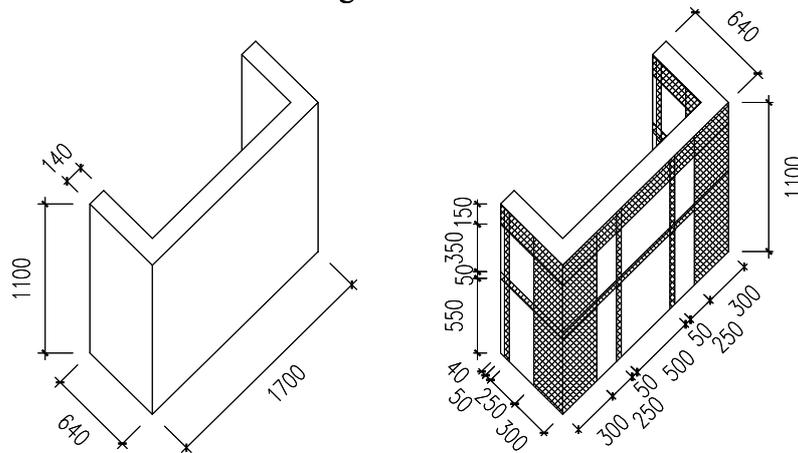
Dimensions (mm) and configuration of specimen A (left), B (right)
